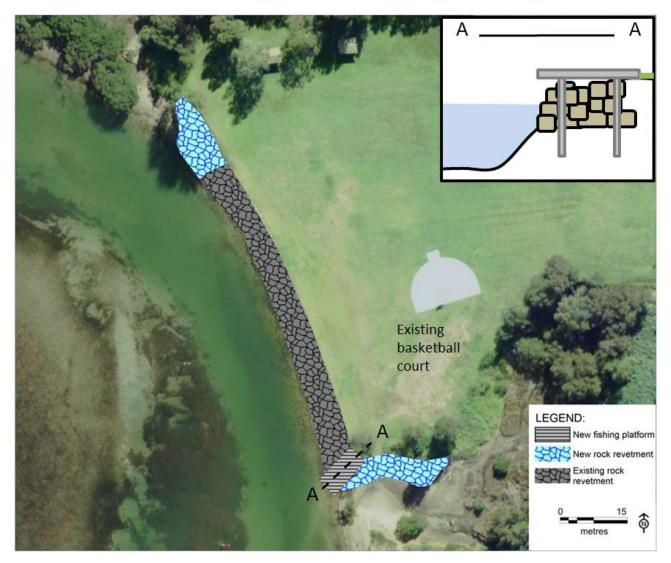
Jack Buckley Park – extension of rock revetment and fishing platform
